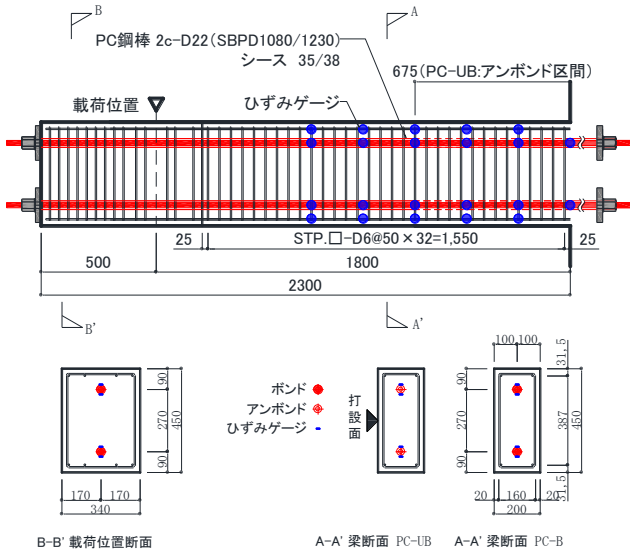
Reinforcement outline and cross-sectional views, strain gage location drawings
